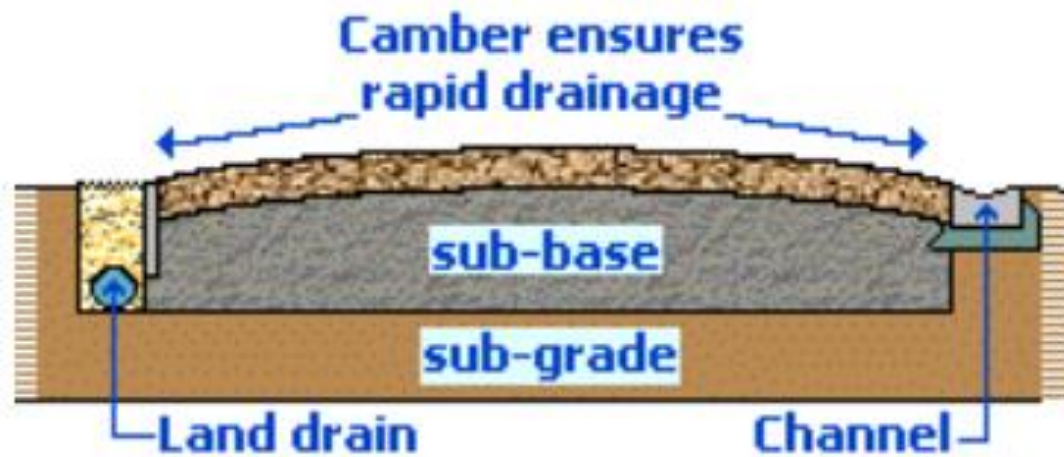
Vertical section of asphalt concrete pavement structure [41].
